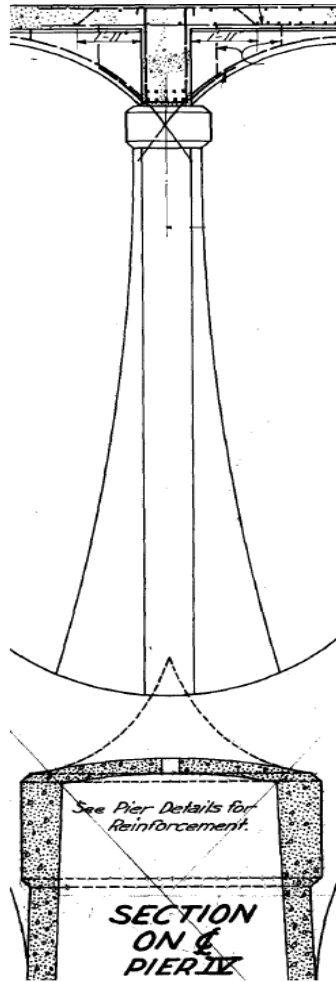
Typical Elevation of Column 3 at Pier IV (AHD 1929)
